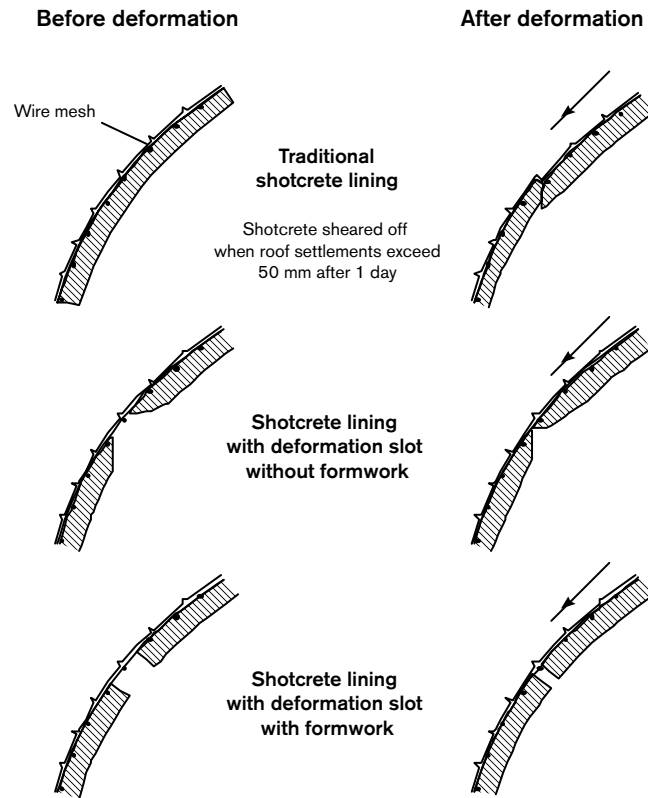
Damage to the shotcrete lining in the Inntal tunnel and development of deformation slots /after Purrer, 1990/.
